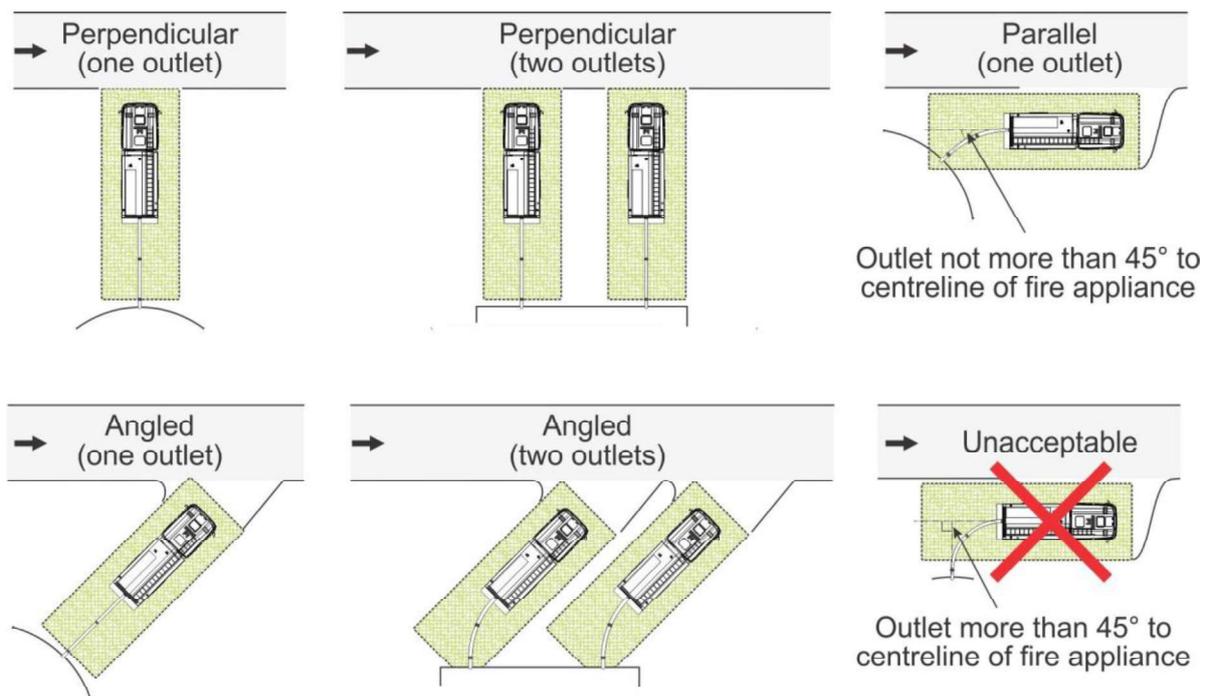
Example of orientation of hardstand area for suction-connection outlets
